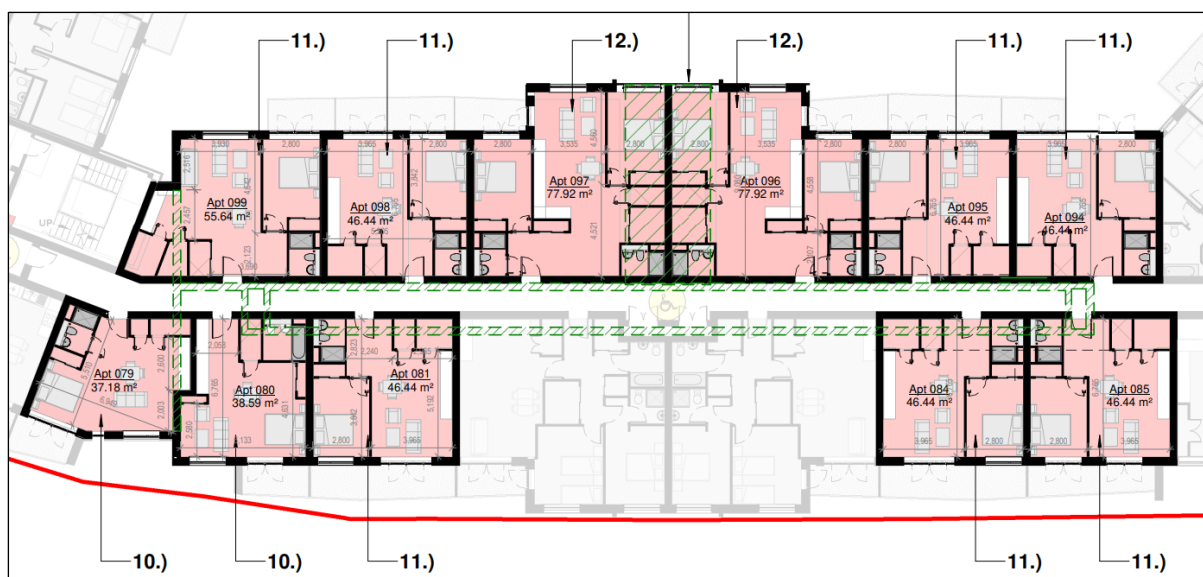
Excerpt from second-fifth floor plans of development proposed under S146B amendment illustrating revised apartment configuration proposed in Block C
